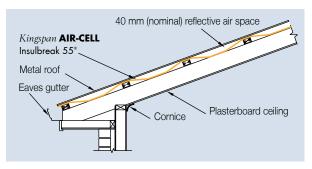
Side elevation of *Kingspan* AIR-CELL Insulbreak® 55 in a metal roof with a raked ceiling
